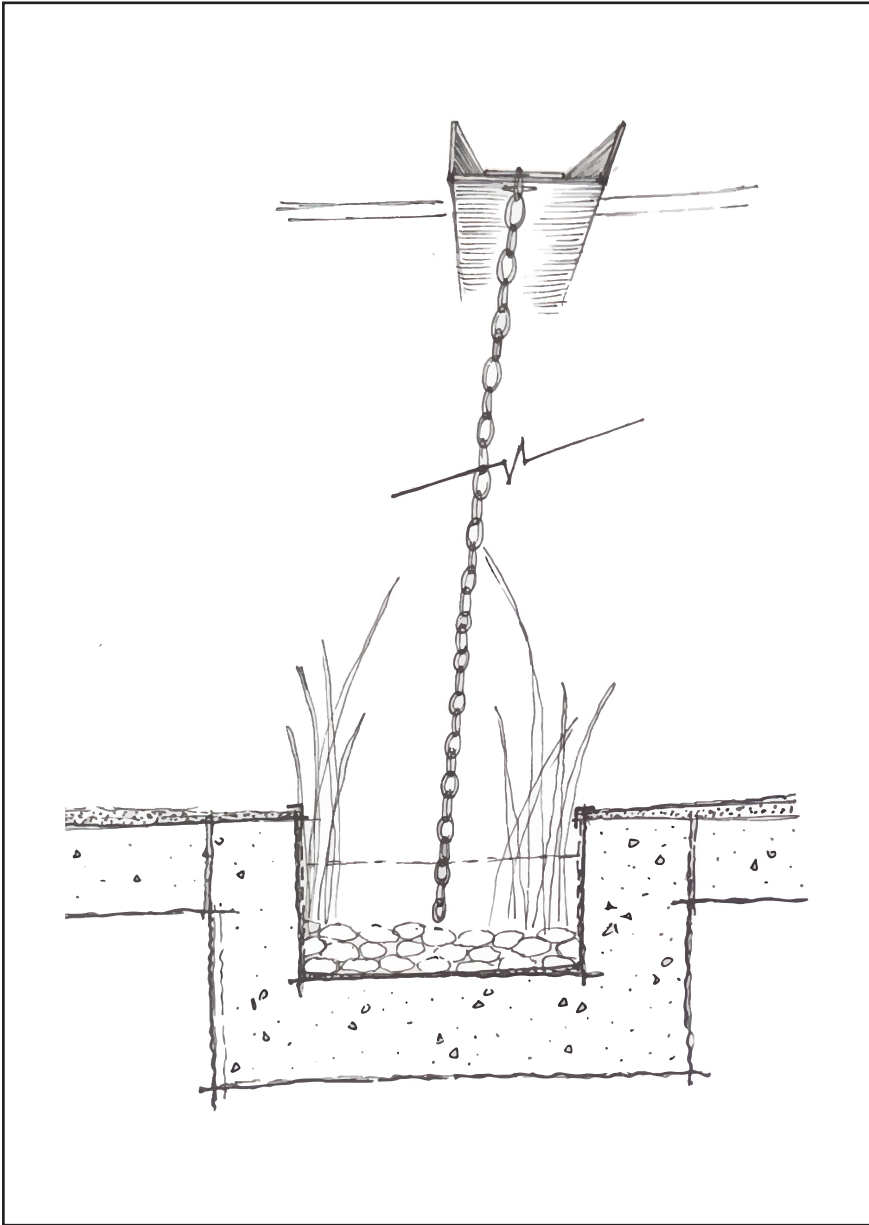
Cornell Teaching Dairy Section (Erdy McHenry 2014)
